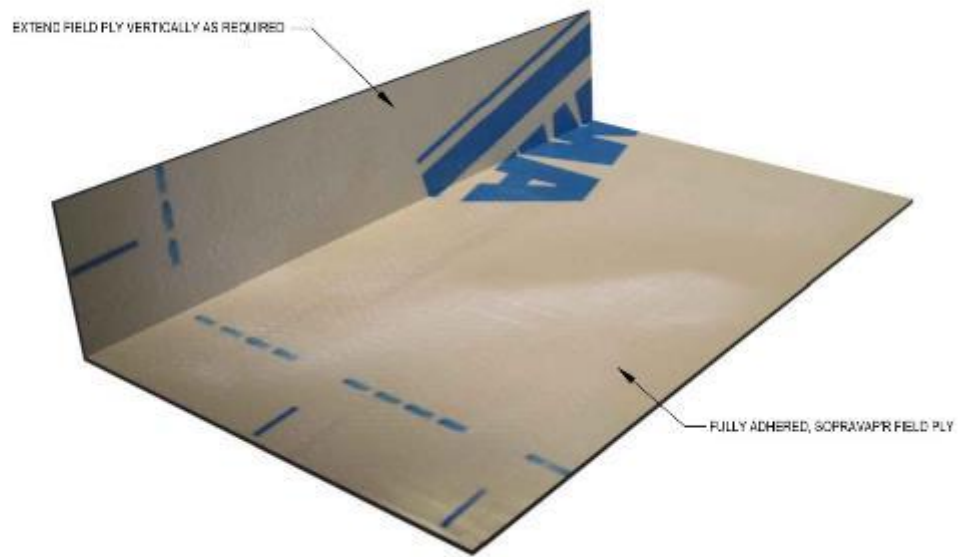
Fully Adhered, Self-Adhesive SOPRAVAP'R Termination at Wall/Curb Without Cant
